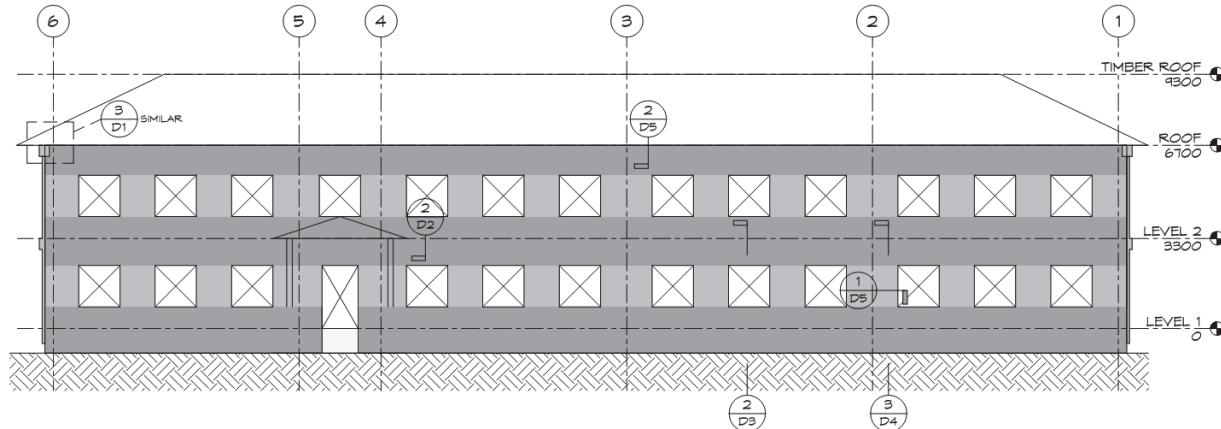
Exterior jacket of reinforced concrete in CM Increment 4.
